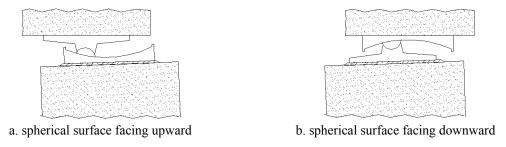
Rotation of the bottom part of a FP bearing installed atop flexible substructures
